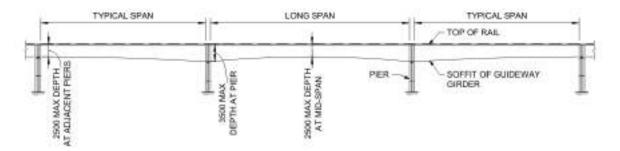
C: 87 Avenue Elevated Guideway Elevation – Variable-Depth Girder (dimensions in mm)
